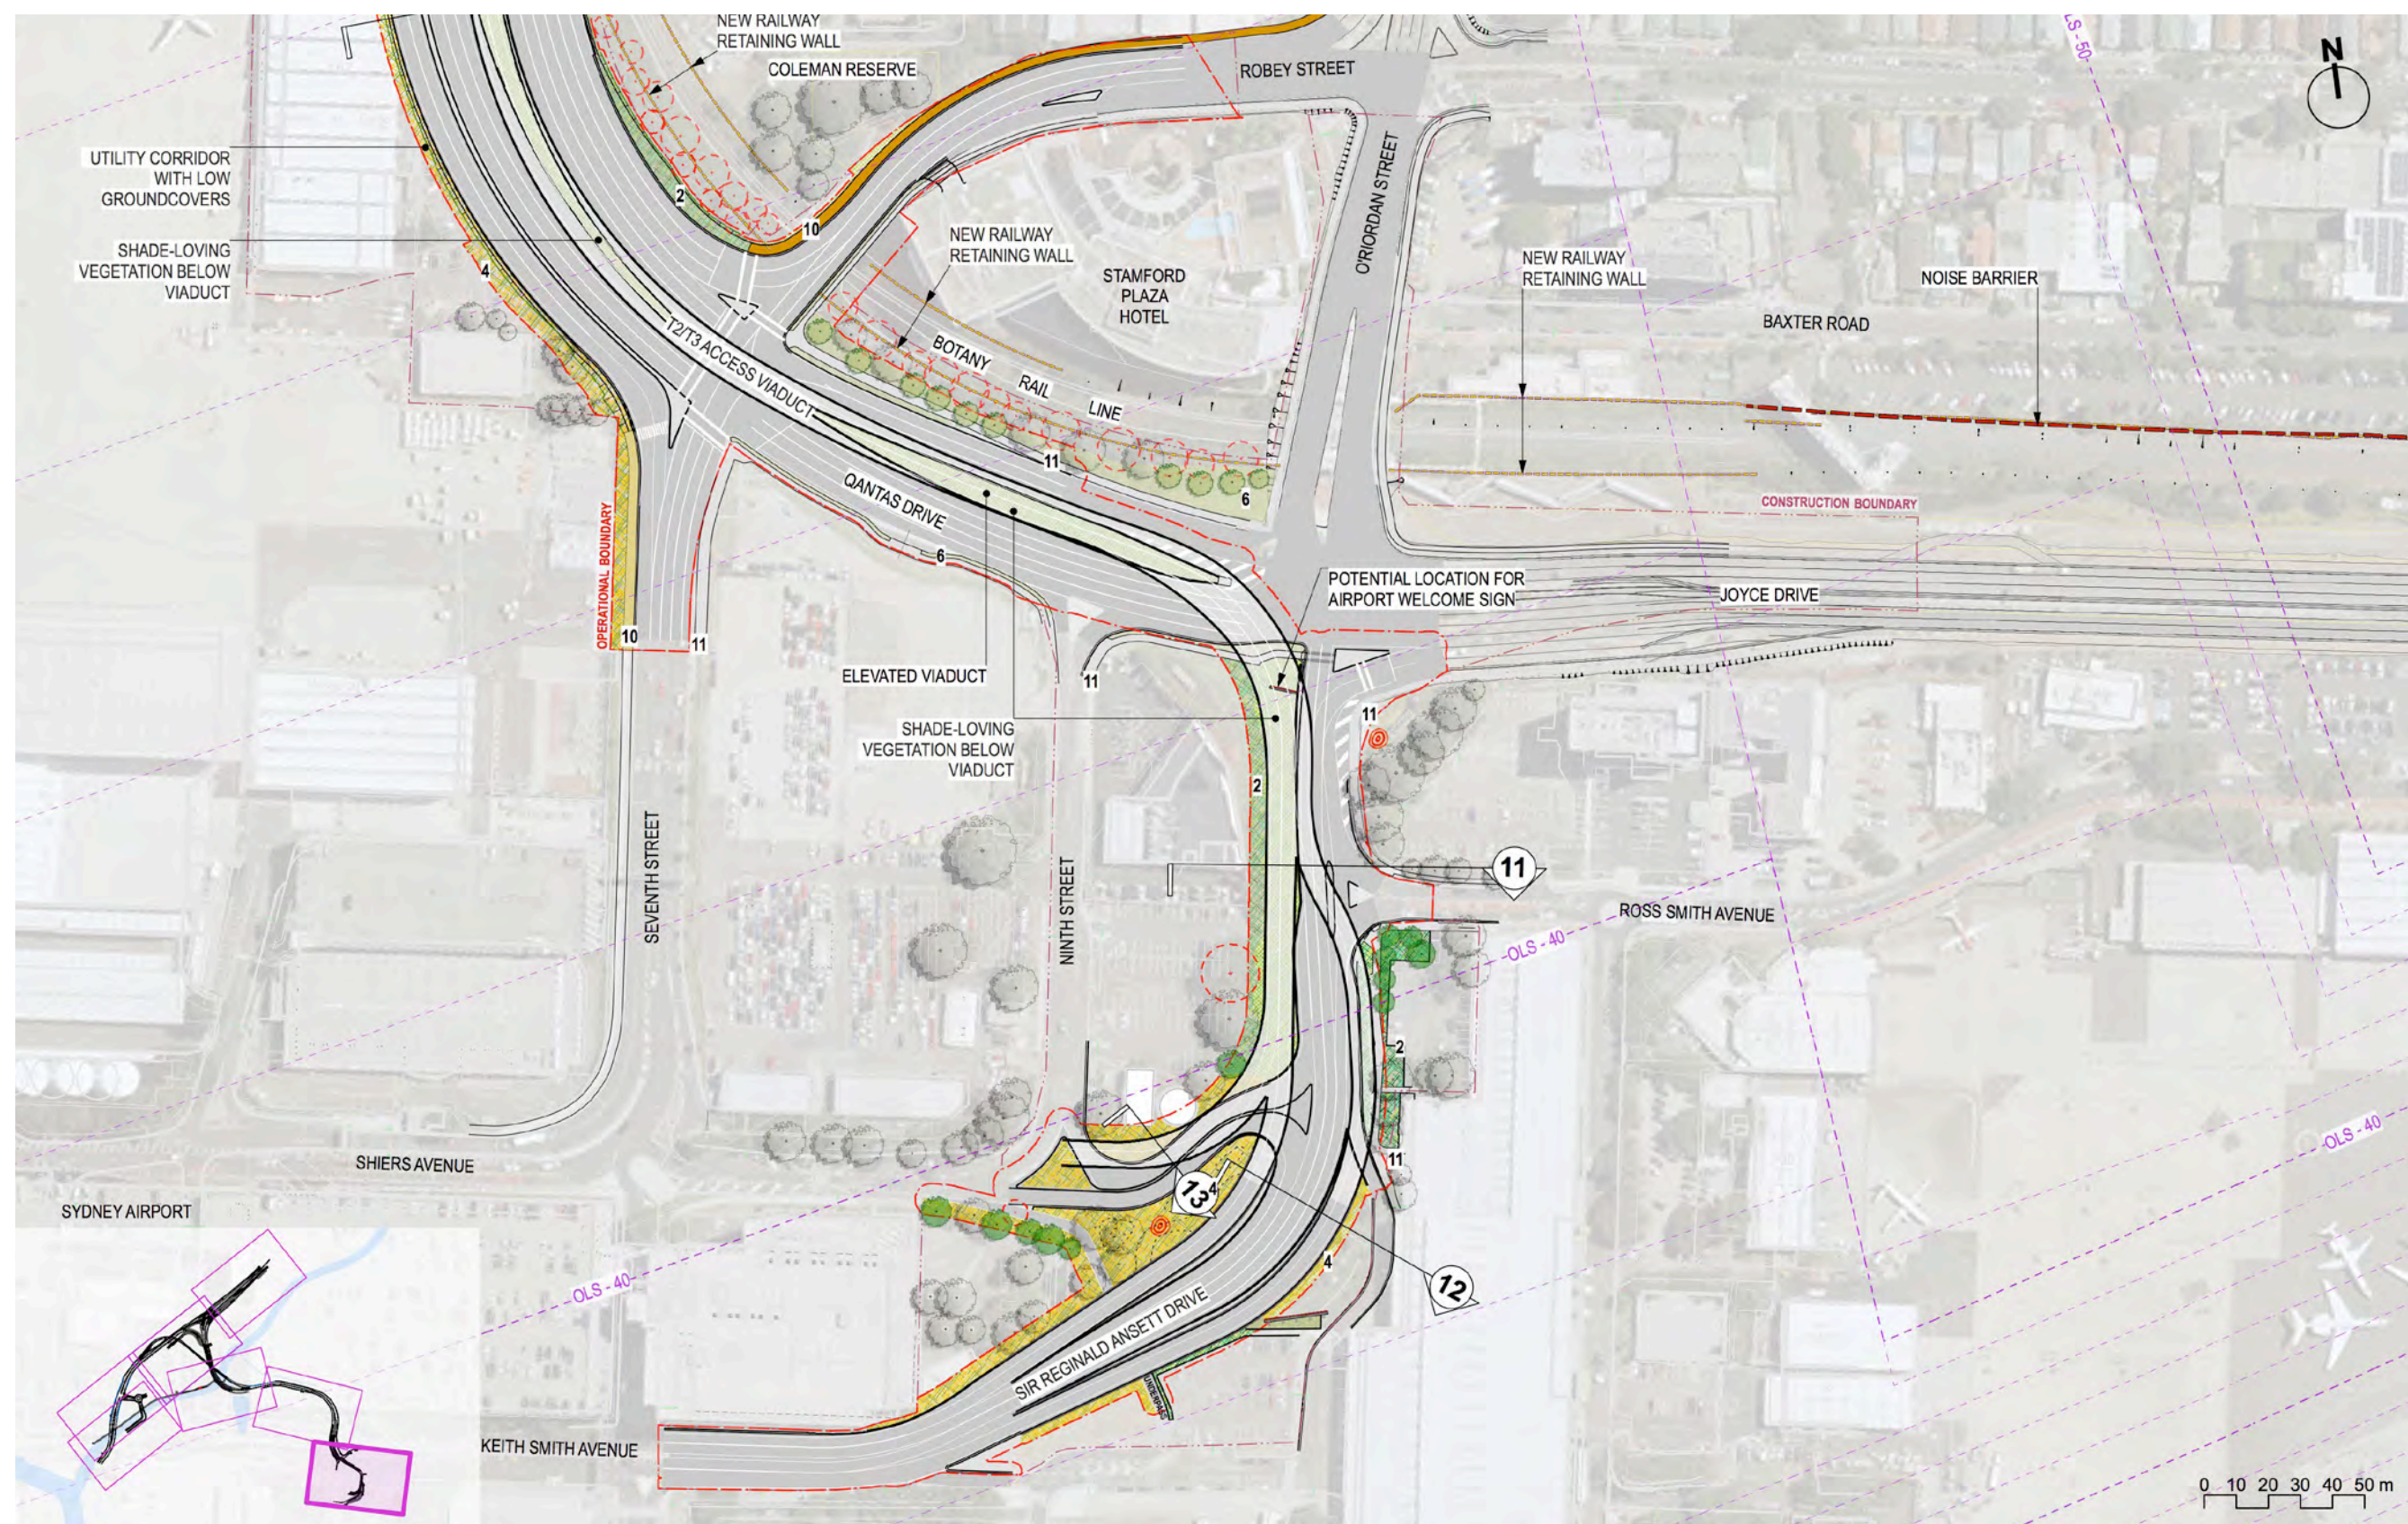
Urban and Landscape Design Concept plan - sheet 7
